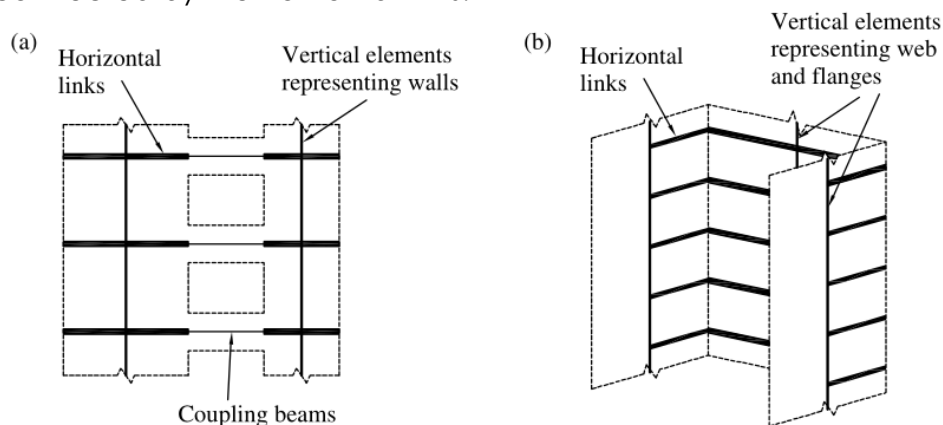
Wide column model of (a) a coupled wall system and (b) C-shaped wall from Beyer et al. [64]
